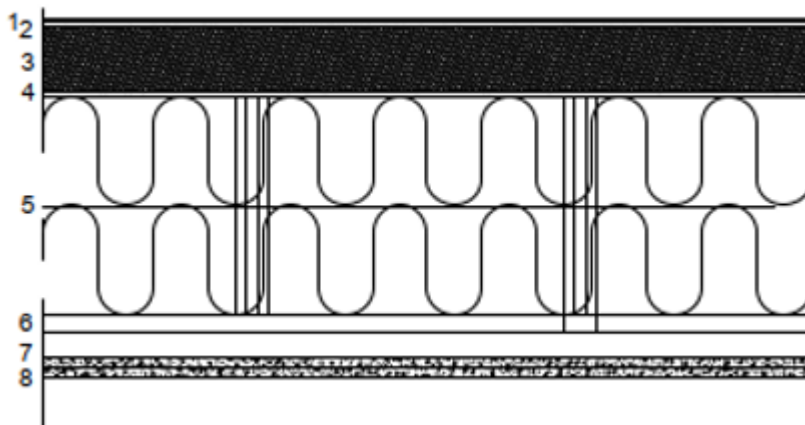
Reference floor 9. Diagram drawn in accordance with the floor type used in Chung et al. study.
